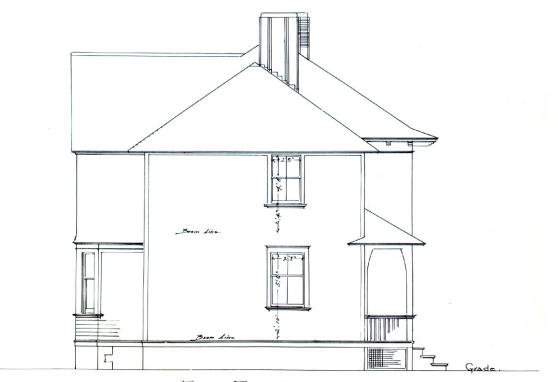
West Elevation of Dwight and Clara Watson House Cass Gilbert Collection, New-York Historical Society
